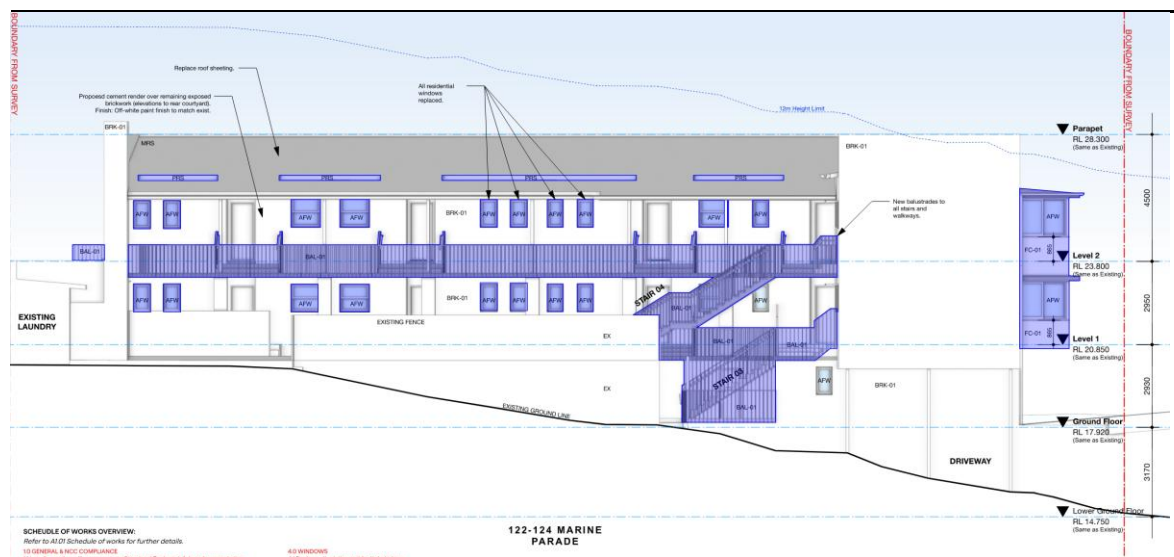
Proposed West Elevation (Source: Hill Thalys – 05/12/2025)
